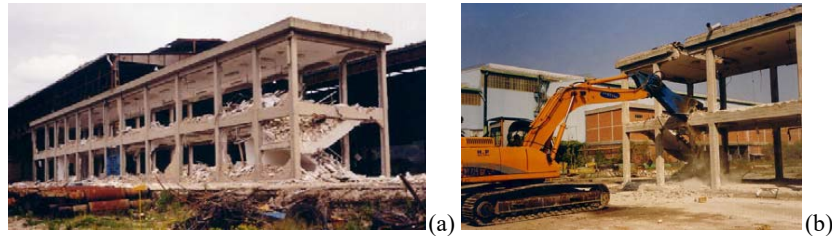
Side view of the original building: north-east (a) and north-west (b) facades.
